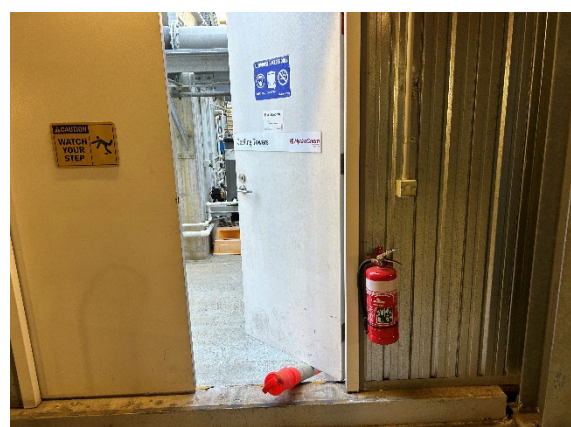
Chemical storage in Level 12 Cooling Tower Area.
